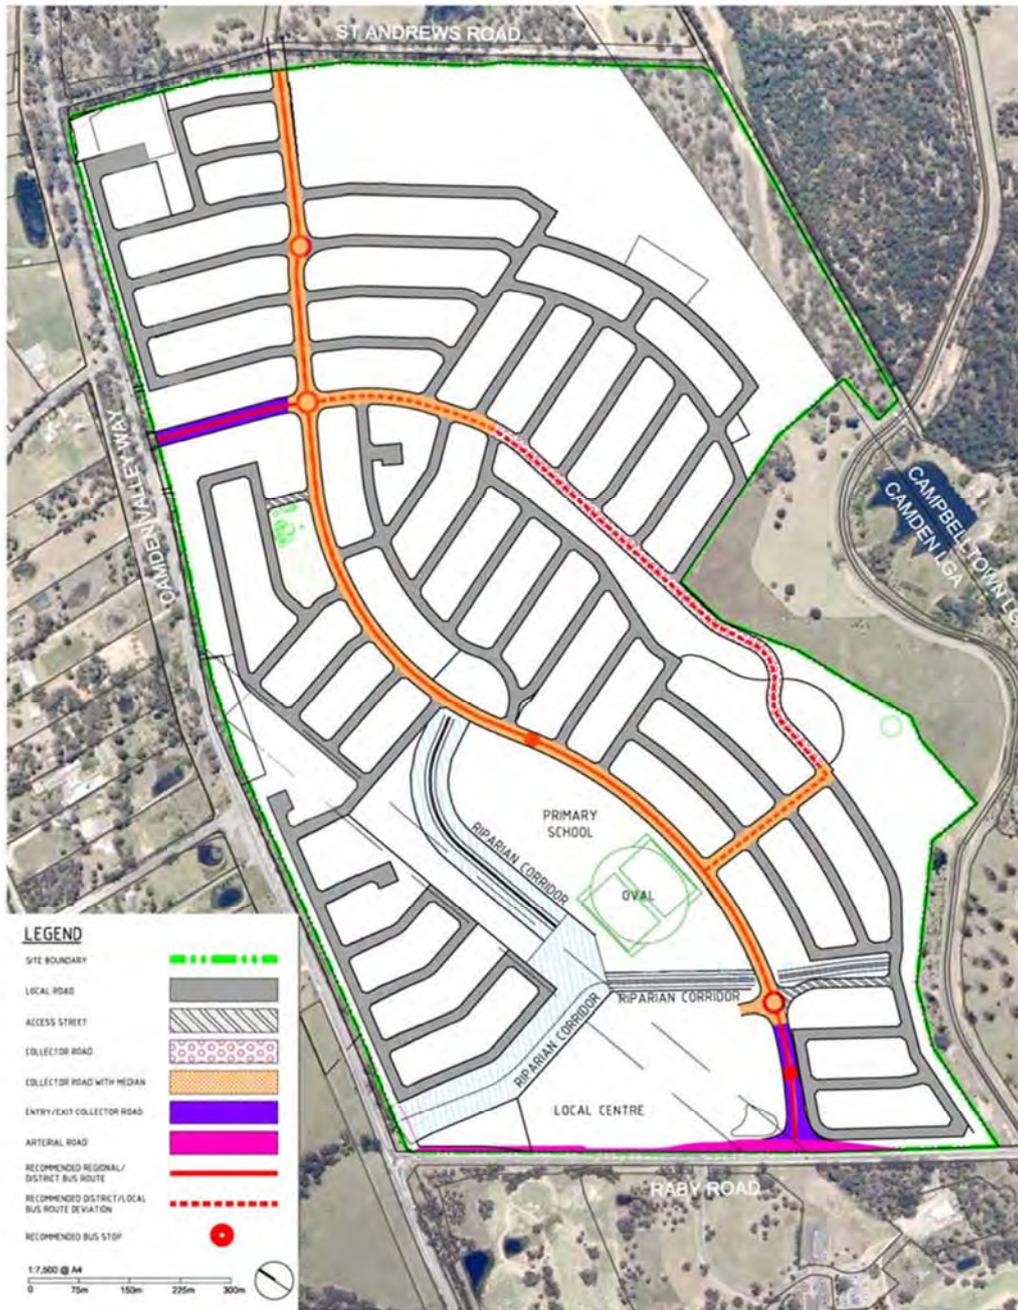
Emerald Hills Road Hierarchy and Bus Route
